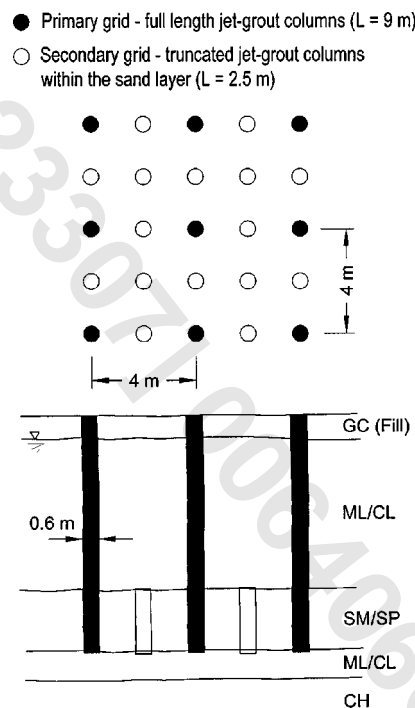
Layout of jet-grout columns used for blanket treatment beneath Shopping Center building at Carrefour site. Additional columns were used at footing locations to provide additional bearing support. Average replacement ratio beneath building was about 7% in the SM layer and 2% in overlying strata.
